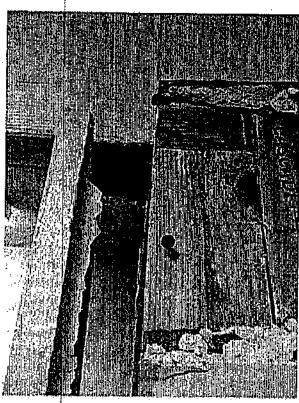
Insufficient connection of LVL beam to column in southwest portion of building.
